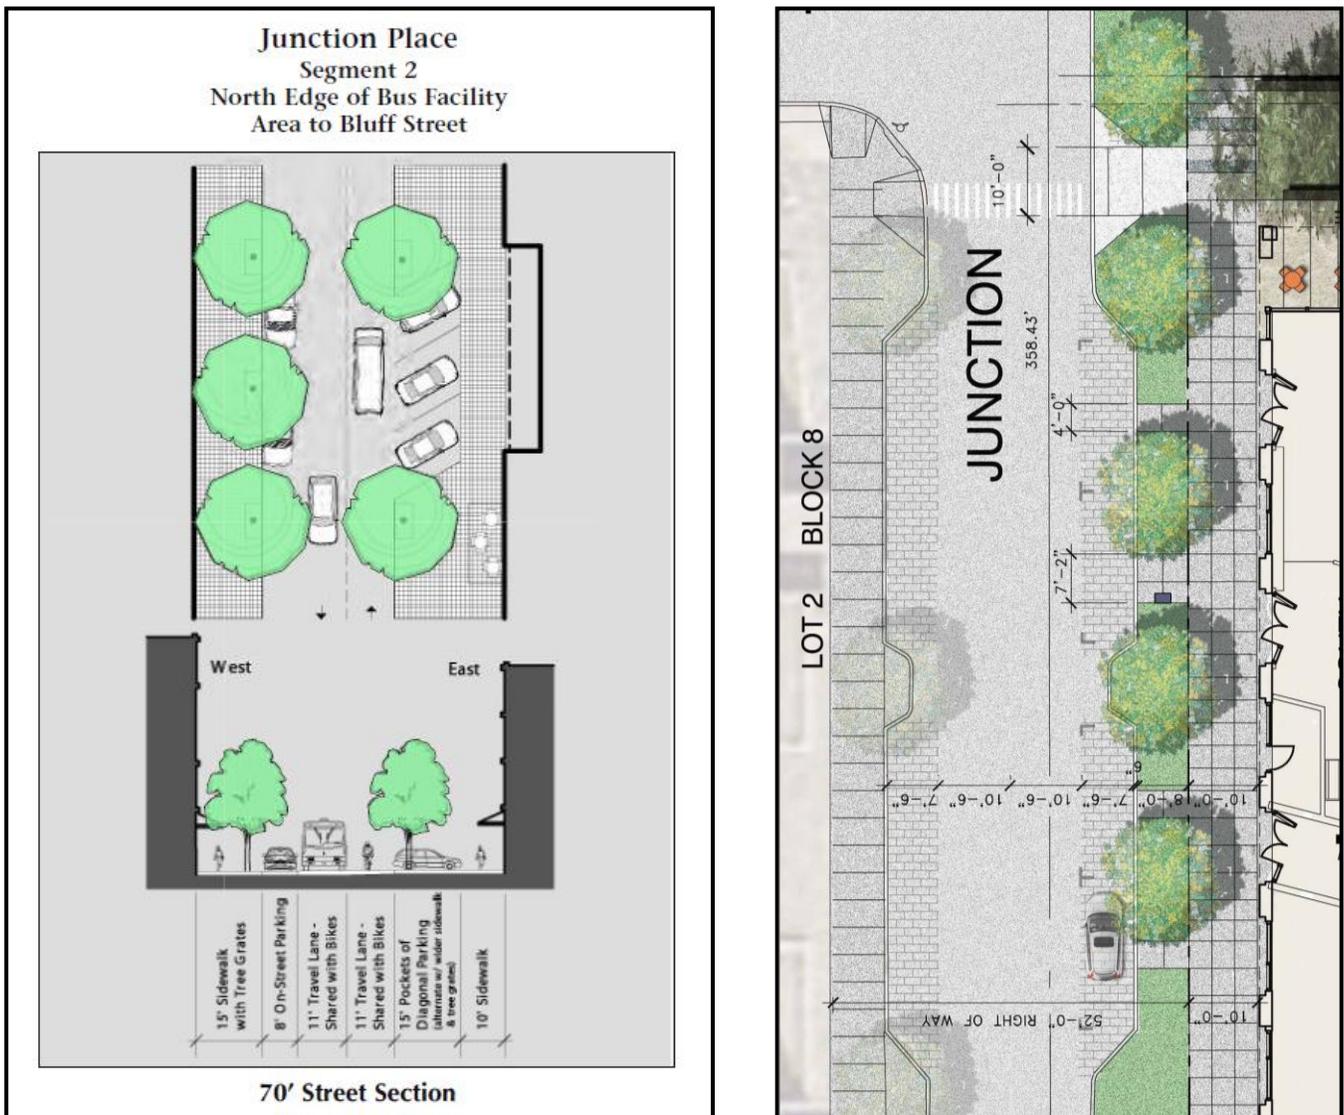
Illustrations comparing TVAP street section (left) with proposed project street section (right)
